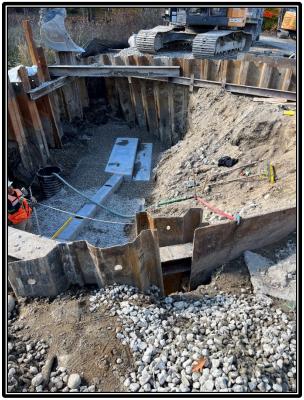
View of Southwest wingwall and cutoff wall from the east side of the excavation.
